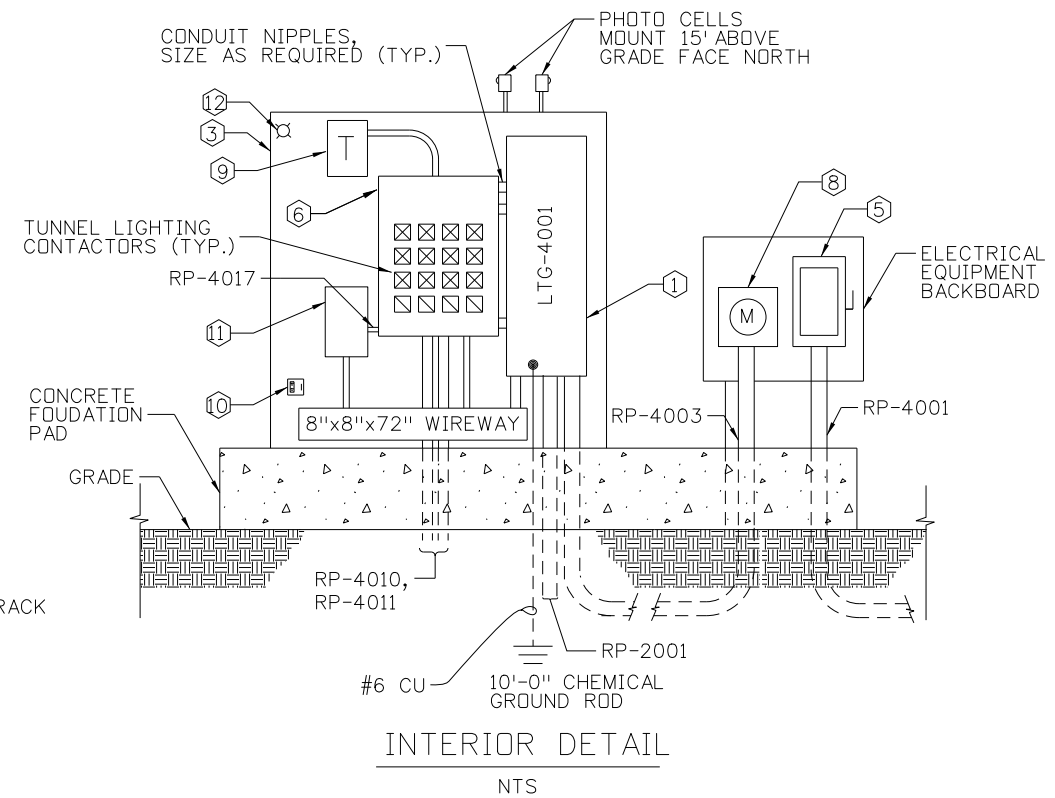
DETAILS: EQUIPMENT ENCLOSURE AT WEST PORTAL
